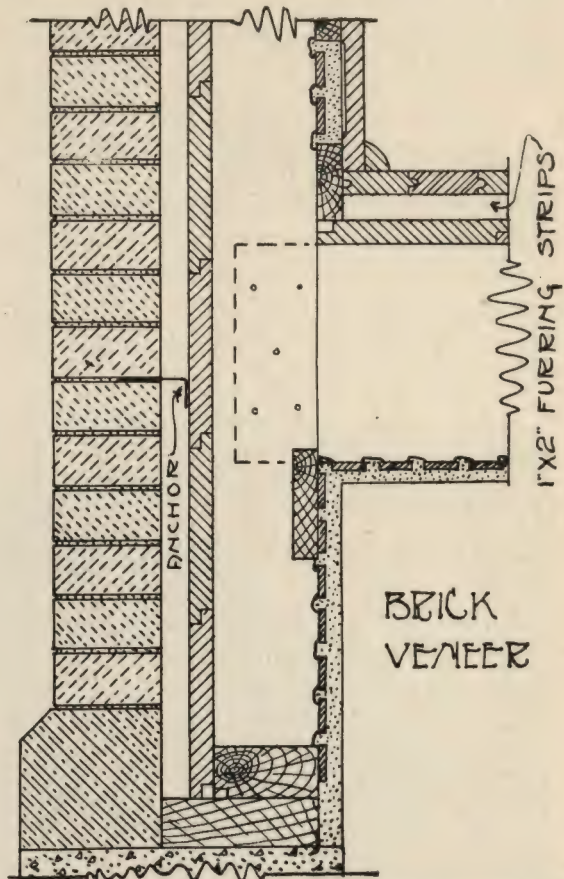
Brick Veneer Wall Section and Approved Sill Construction.
